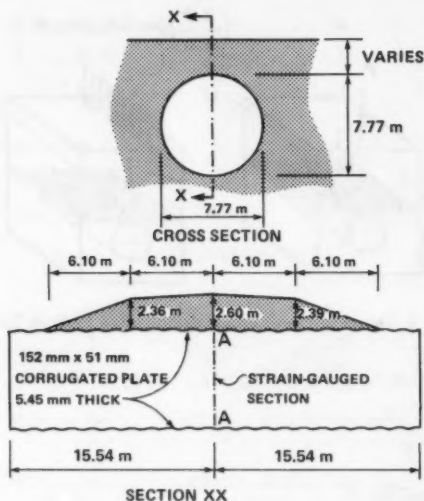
Details of Deux Rivières Soil-Steel Structure
